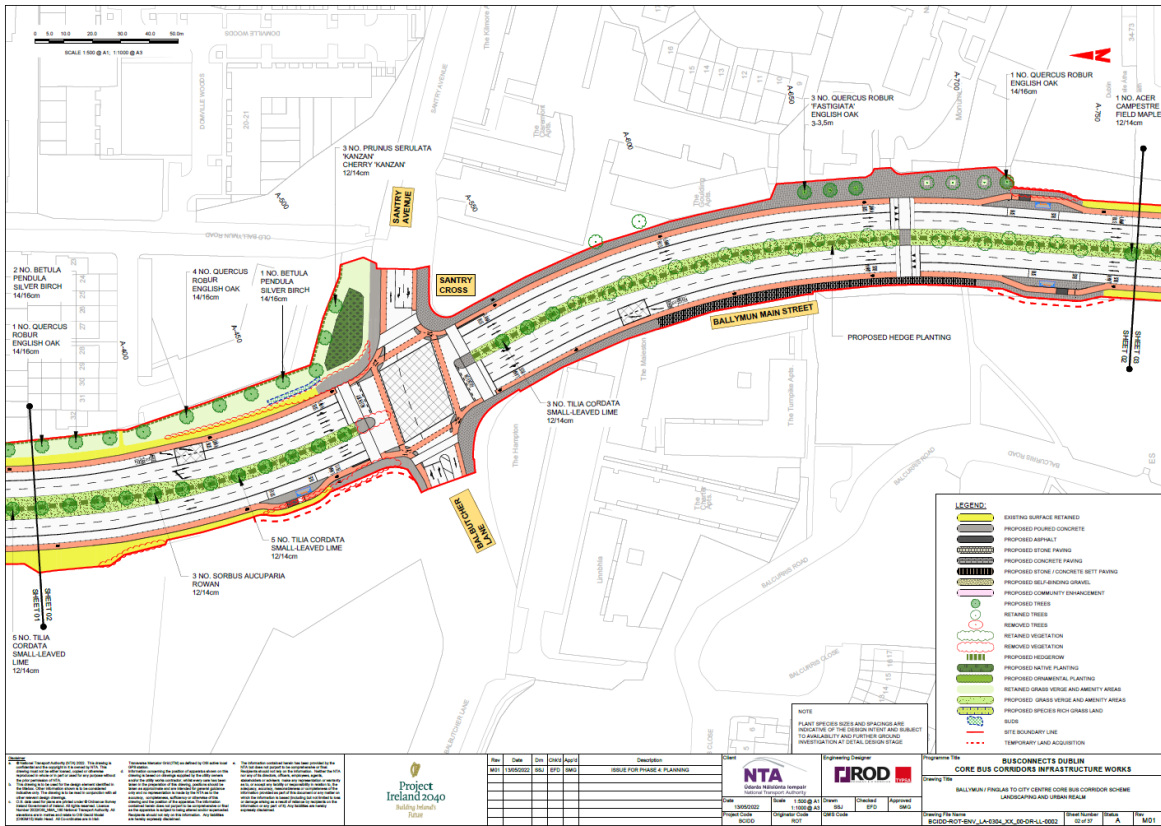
Landscape General Arrangement Drawing Sheet 2 at Ballymun
